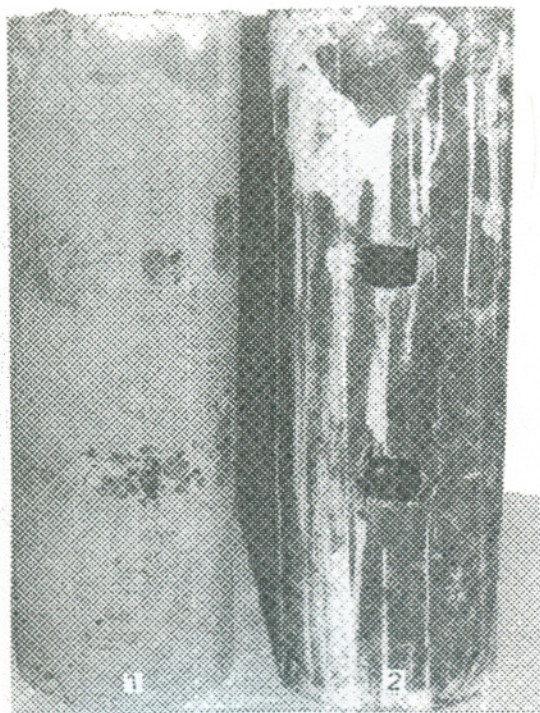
Column JORA35 - L600 at Failure: (1) part of concrete cover were spilled off; (2) Local buckling occurred in the steel jacket; (3) Vertical cracks at the region of the jacket connection;
